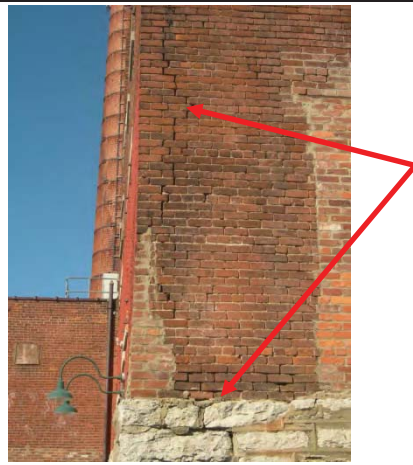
East-SE corner close up of structural crack continuing down into stone foundation
